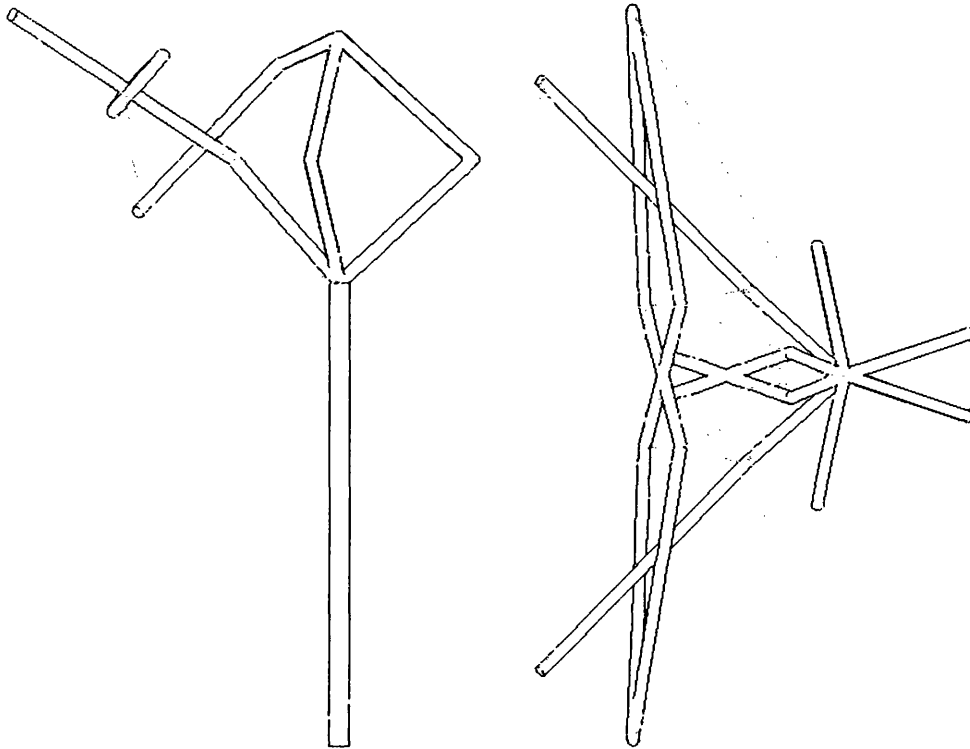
Plan and elevation of dome sub-structure attached to foundation
